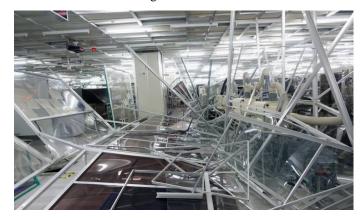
Non-structural Element Failure Inside Sony's Sensory Plant [3]
